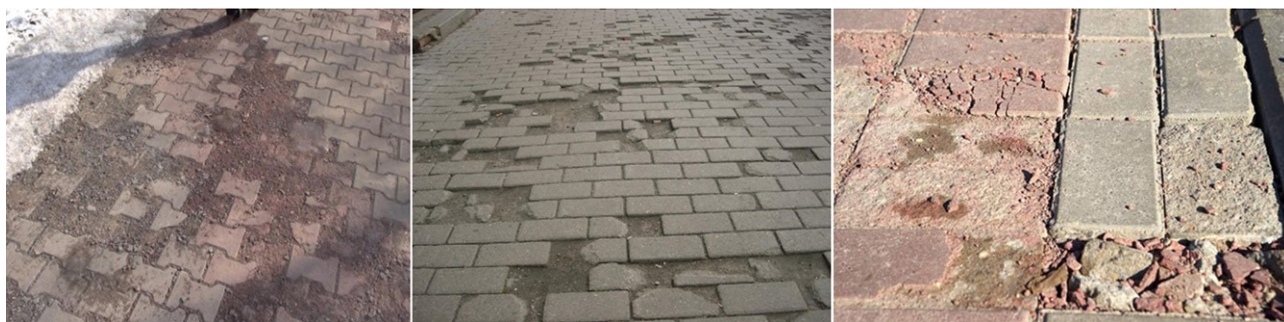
Fragments of the destruction of sidewalks made of concrete pavers
